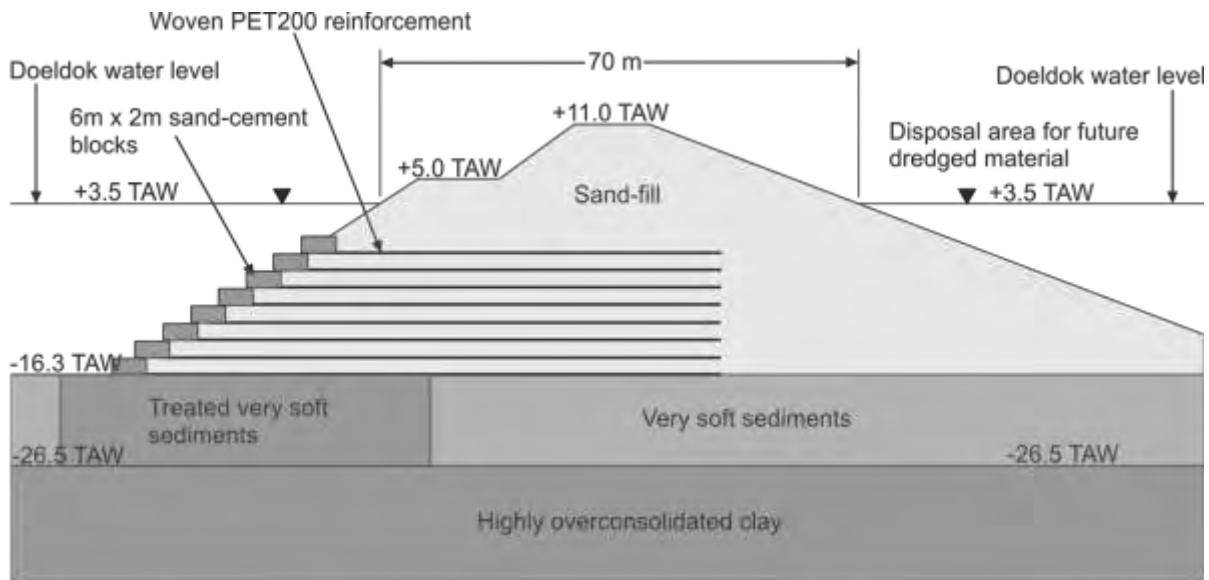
Basal reinforced seawall on soft foundation (After Ameratunga et al., 2006).
